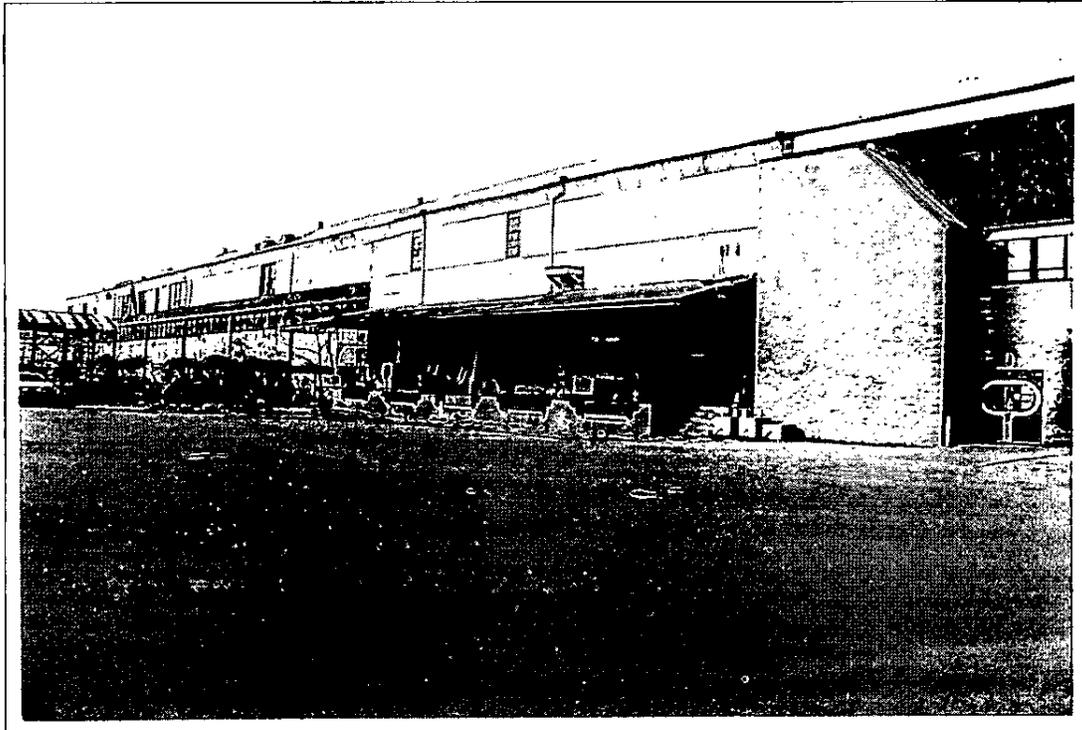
Harlan & Hollingsworth Plate Punch Shop (N-12458), east and north elevations
